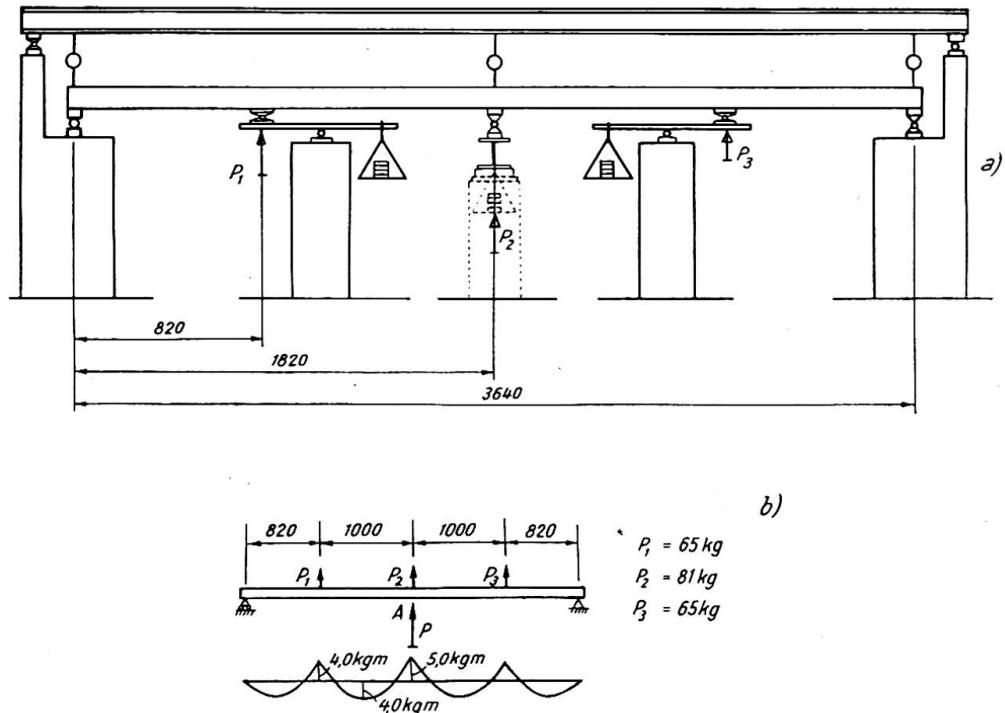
Loading devices and measuring equipment for the shrinkage tests on concrete beams
